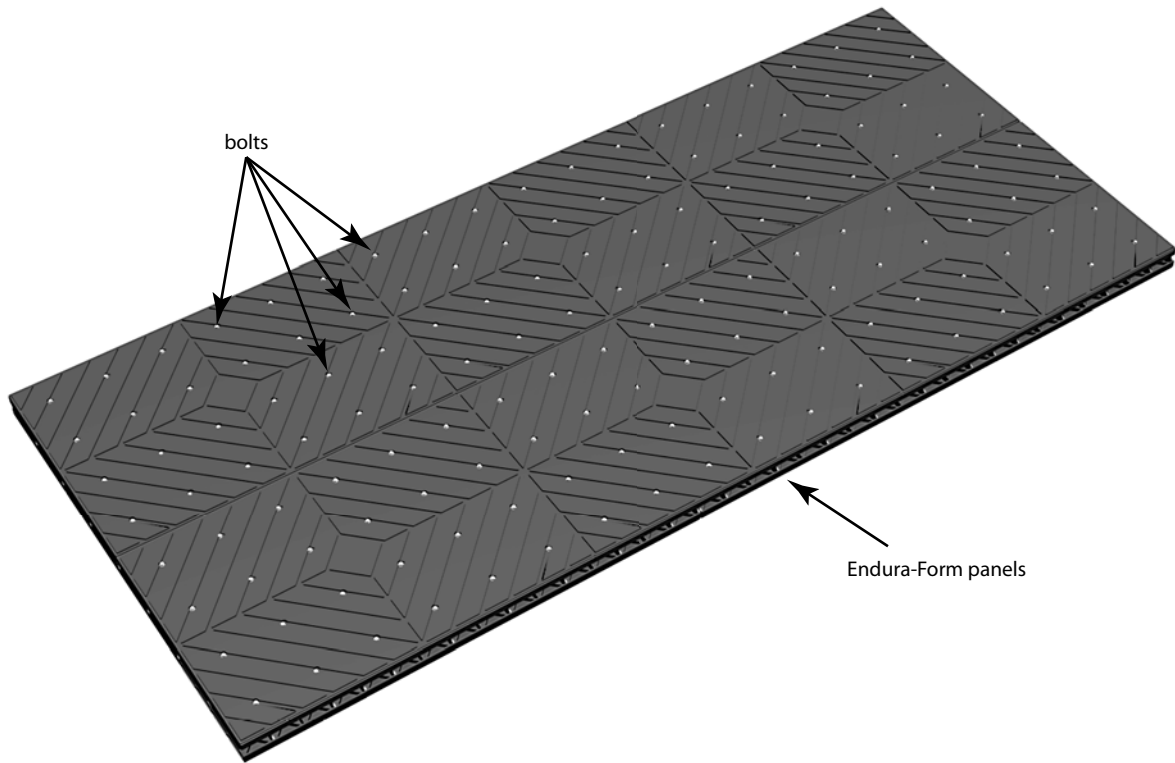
This is the same view but with the bolts in place. These bolts thread into integral nuts fitted in the bottom layer panels.
